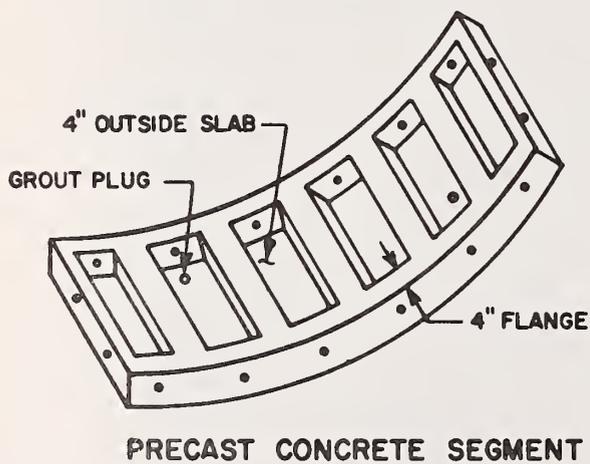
SEGMENTED TUNNEL LINING ERECTED IN THE TAIL OF A SHIELD
